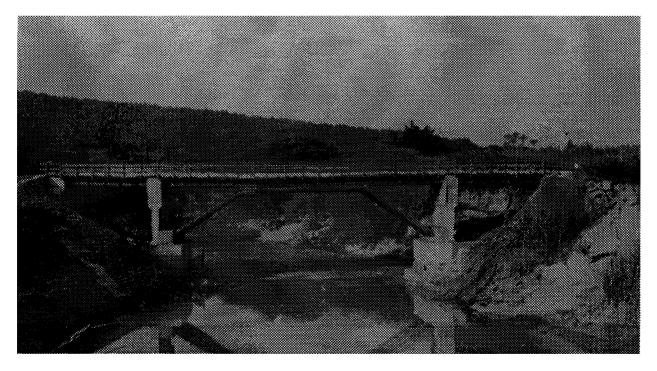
Composite log beam bridge over Vespasiano river. This strut frame bridge is 32 meters long, 20 meters span, consists of four longitudinal composite log beams of eucaliptus specie and was built in 1983.
